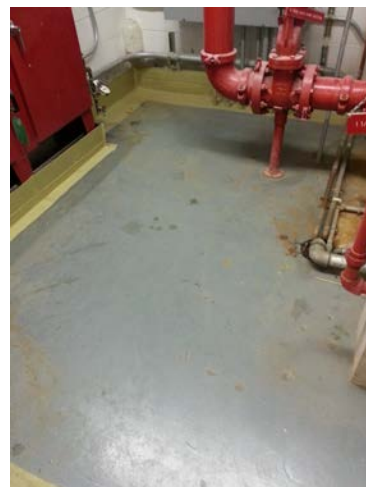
View of typical bare floor in the Fire Pump Room (Room C20D).
